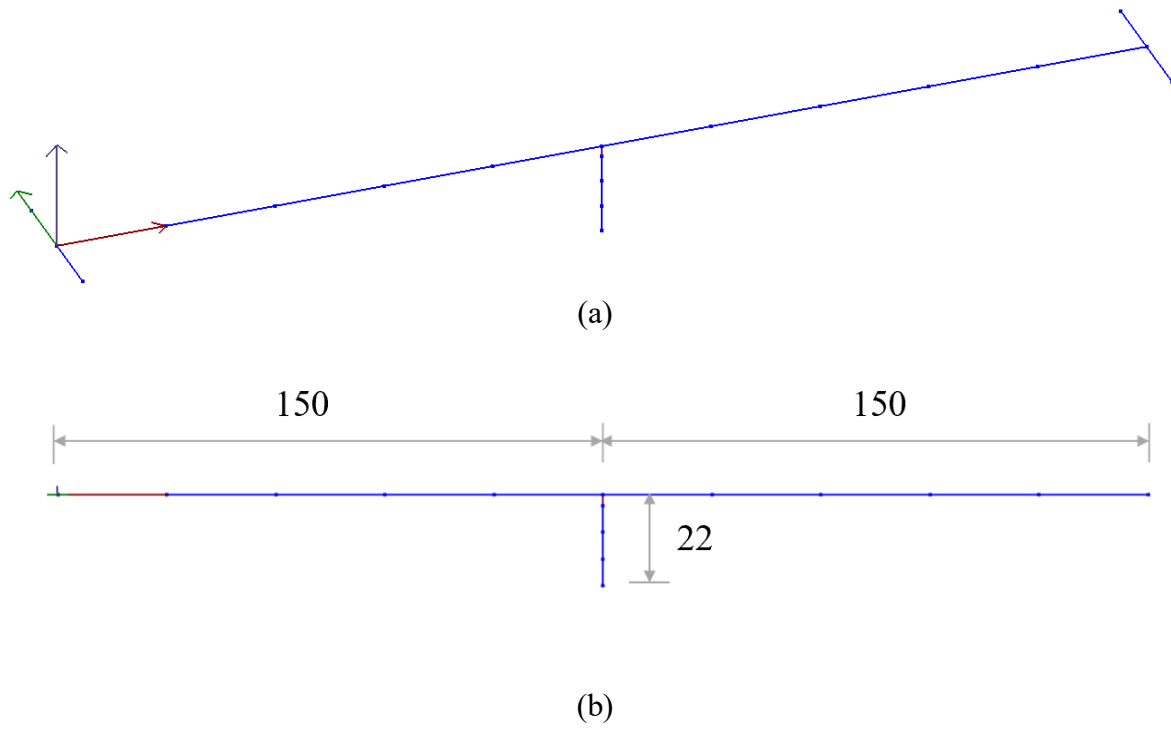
Finite element mesh: (a) 3D view, (b) elevation view (dimensions are in ft)
